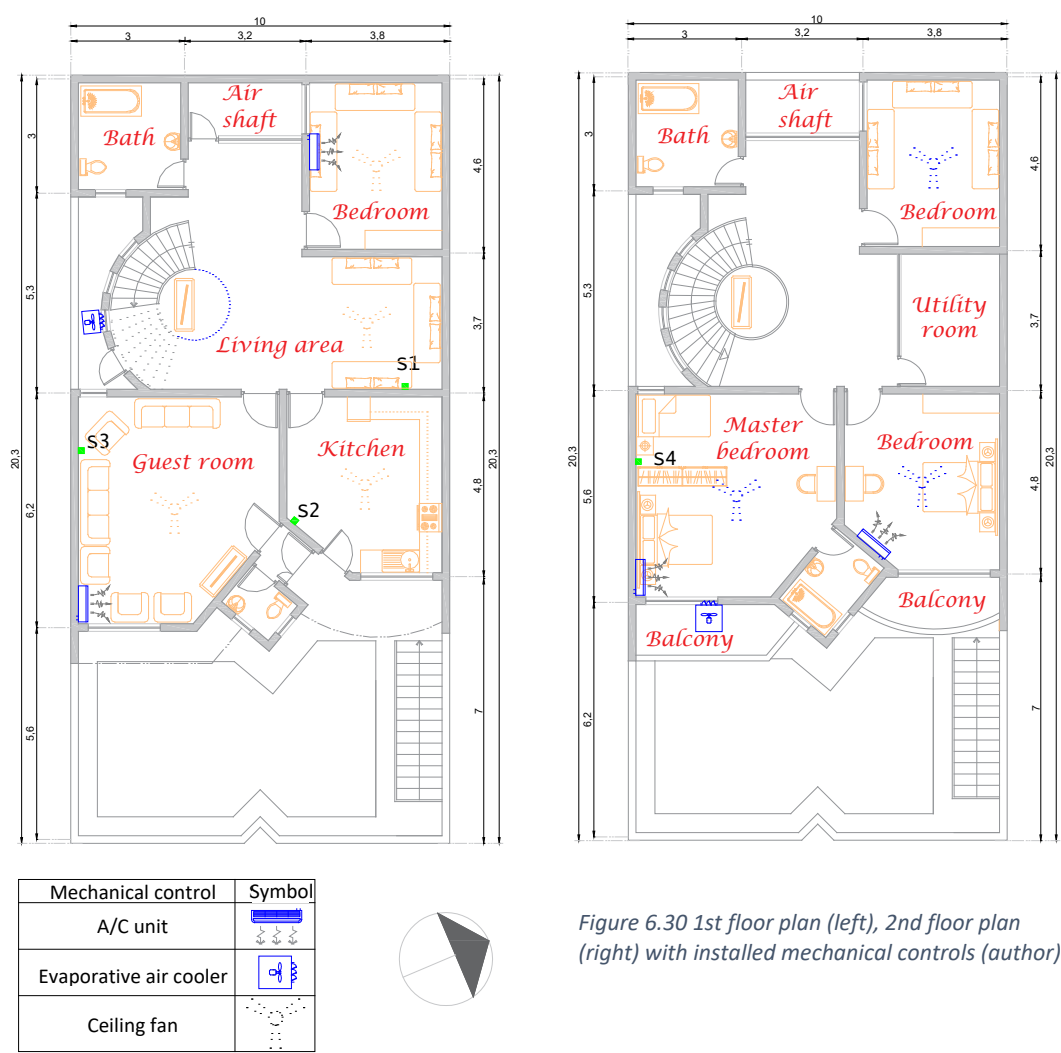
1st floor plan (left), 2nd floor plan (right) with installed mechanical controls (author)
